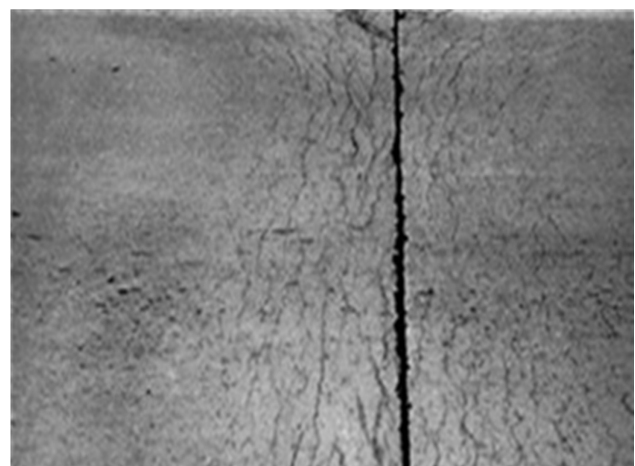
Fracture on the edge of concrete slab in Vietnam [4]
